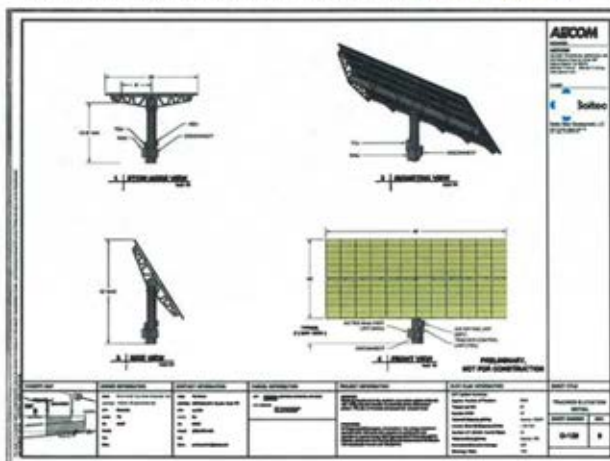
Tierra del Sol Solar Farm tracker elevation detail [Click on image to enlarge]
